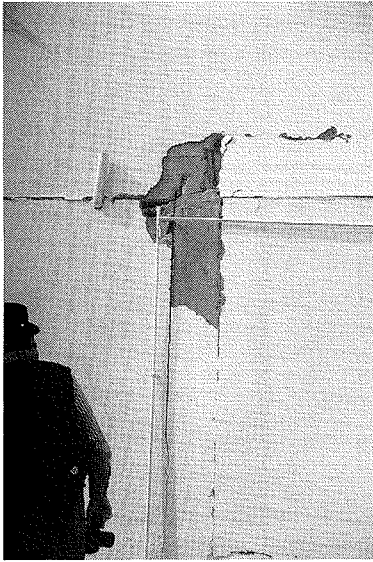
Design with strong beams and weak columns, and poorly treated horizontal construction joint.
